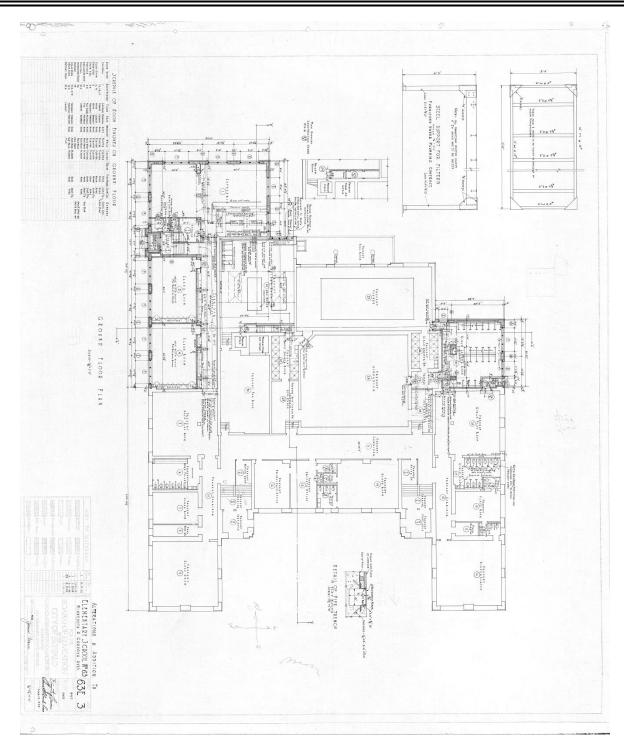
Ground floor Plan, School No. 63 Addition, Associate Buffalo Architects, Inc. 1925. Note area outlined in dark ink is addition.
